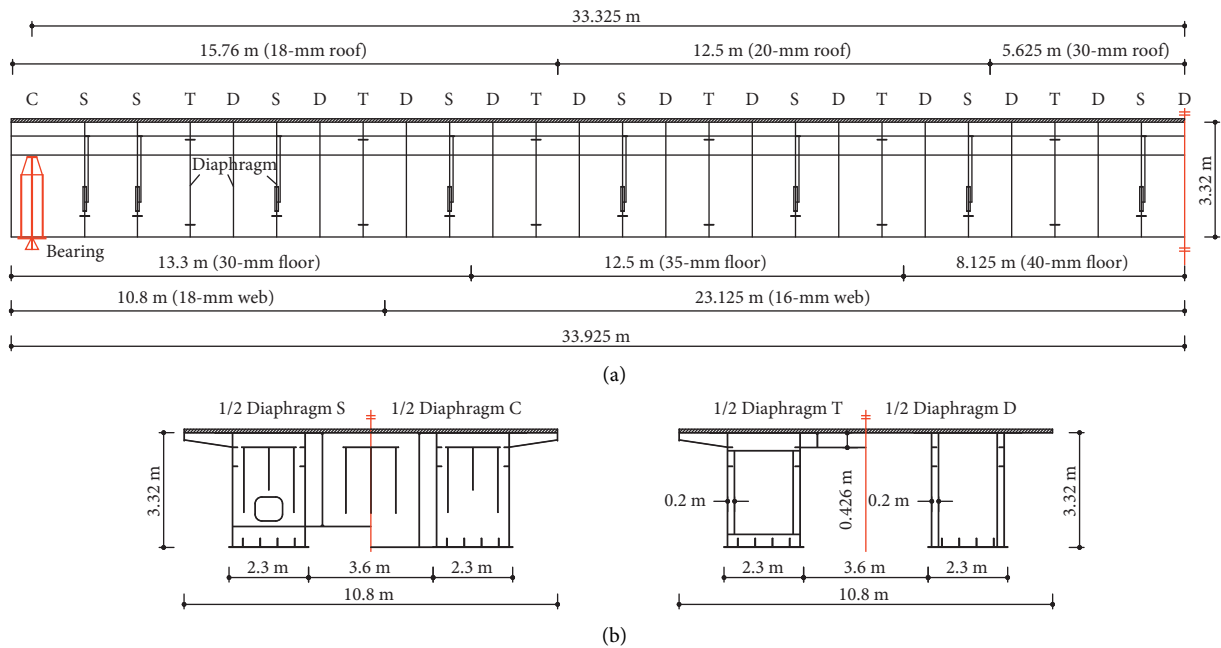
Structural profile of bridge girder: (a) elevation view of main plates; (b) section view of diaphragms S, C, T, and D.
